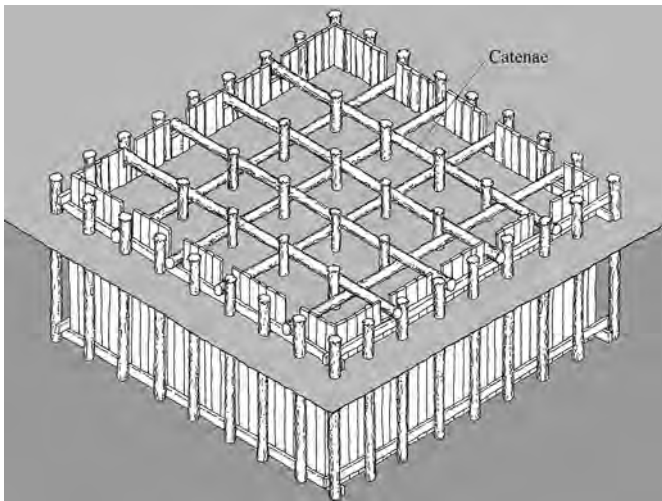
Reconstruction of horizontal tie beams (catenae) fixed to the upper horizontal rail installed in the fifth and final phase of building a Category 1 form (C. J. Brandon).
